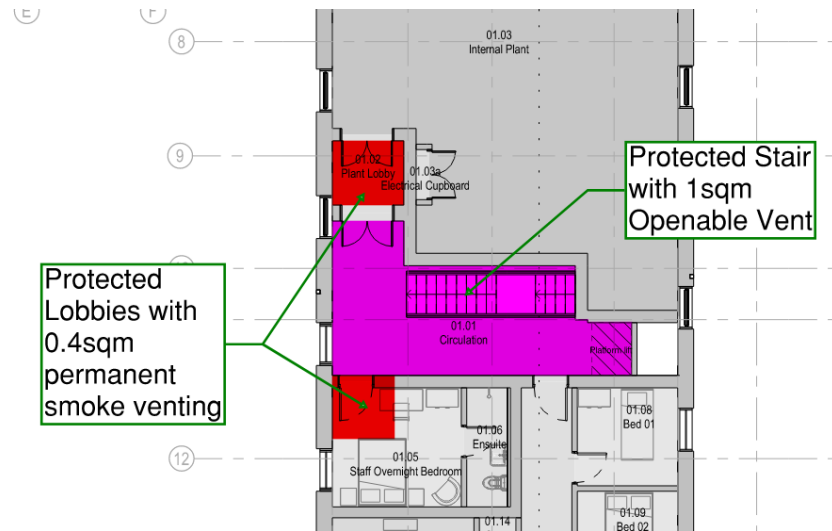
Main Building First Floor Protected Escape Route Arrangement
